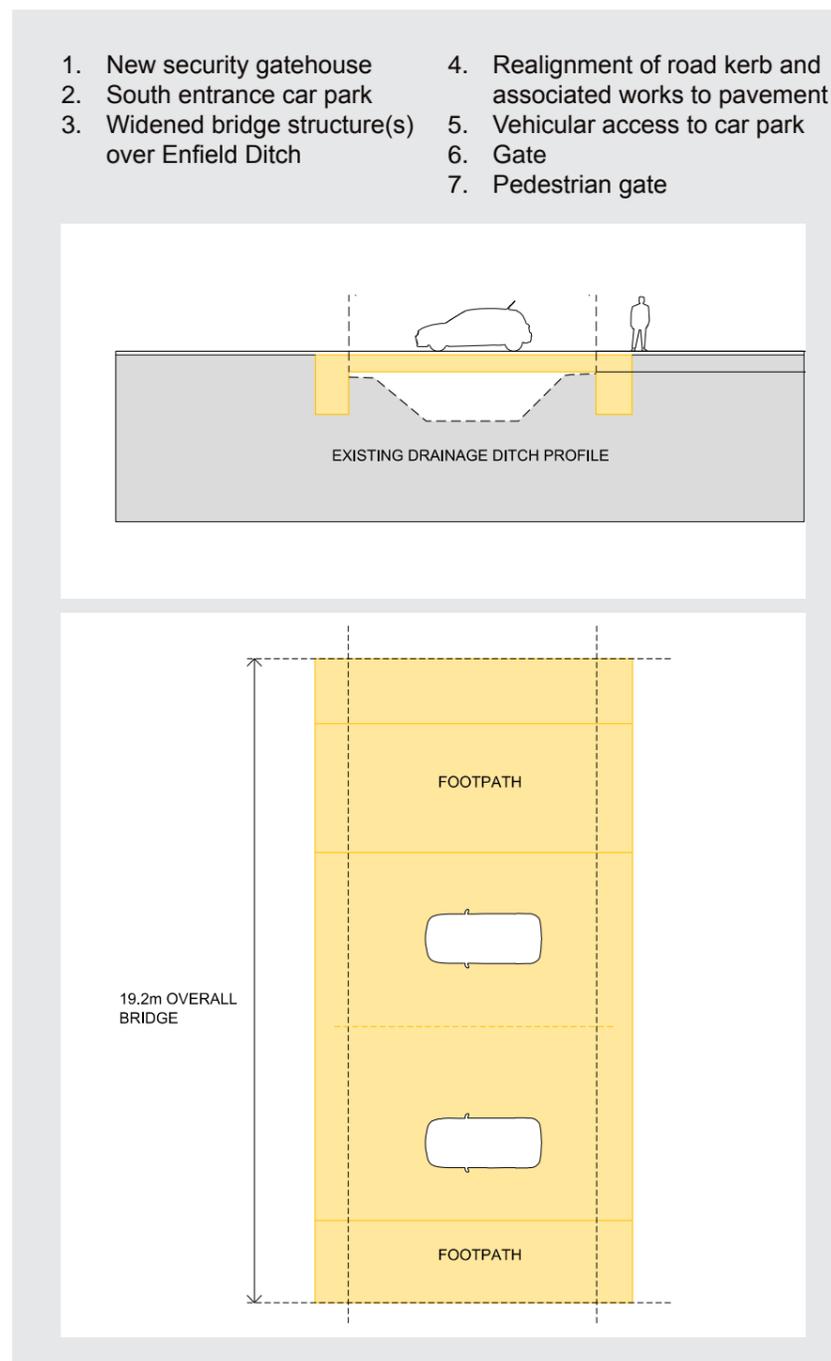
Illustrative plan and section of the access bridge over Enfield Ditch, showing proposed improvements and extension.
